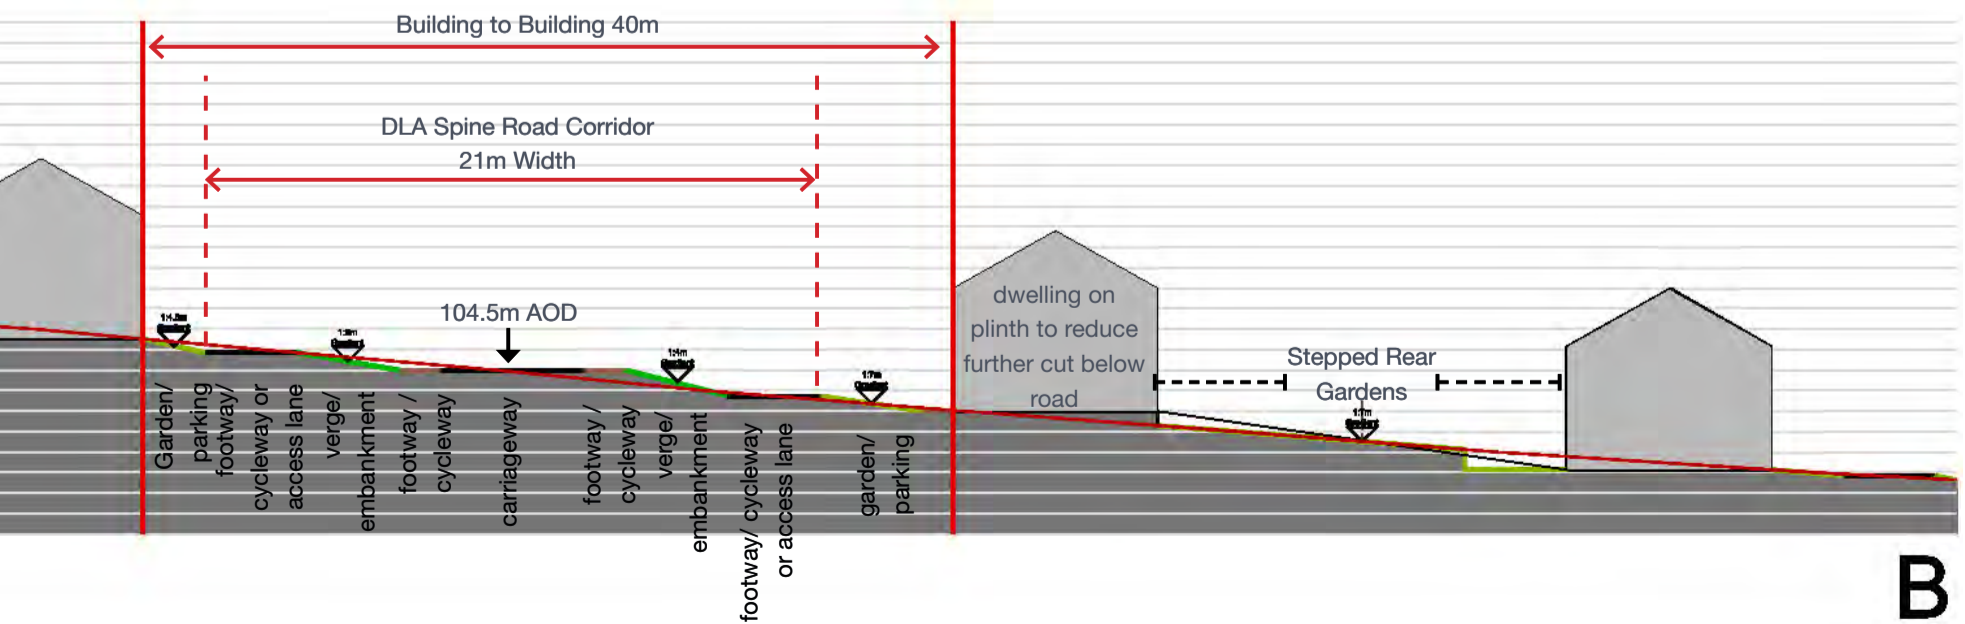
Cross Section B- B Through Spine Road to Dwellings Either Side
